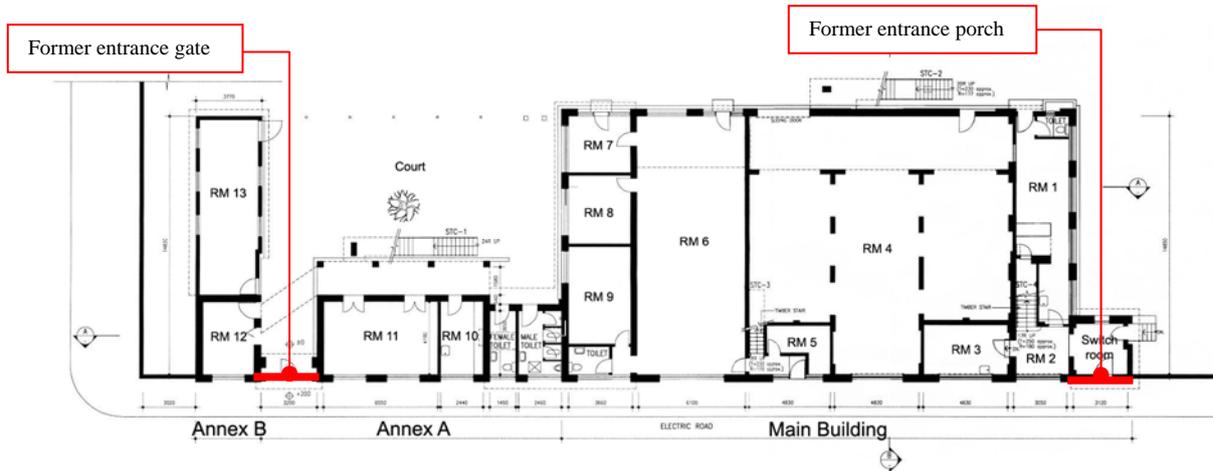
The former entrance gate (left) and the former entrance porch (right) of the main building.
